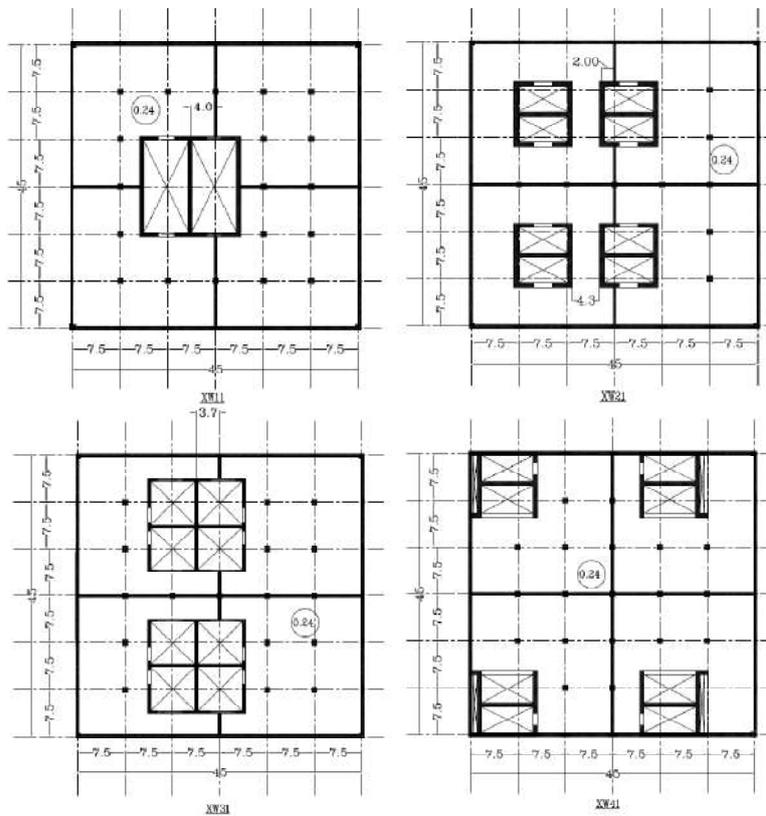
Structural Systems used in Core (Shear Wall) with Outrigger.
